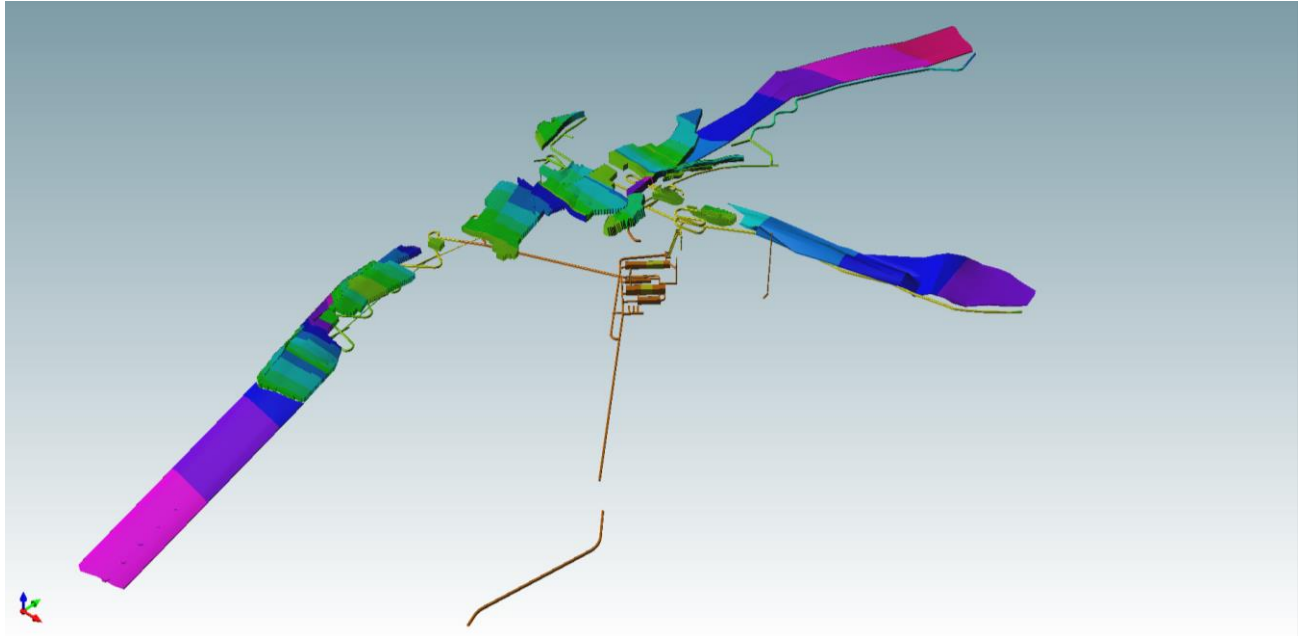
Conceptual Mine Plan and Underground Plant Layout for Colonna Zorzone
